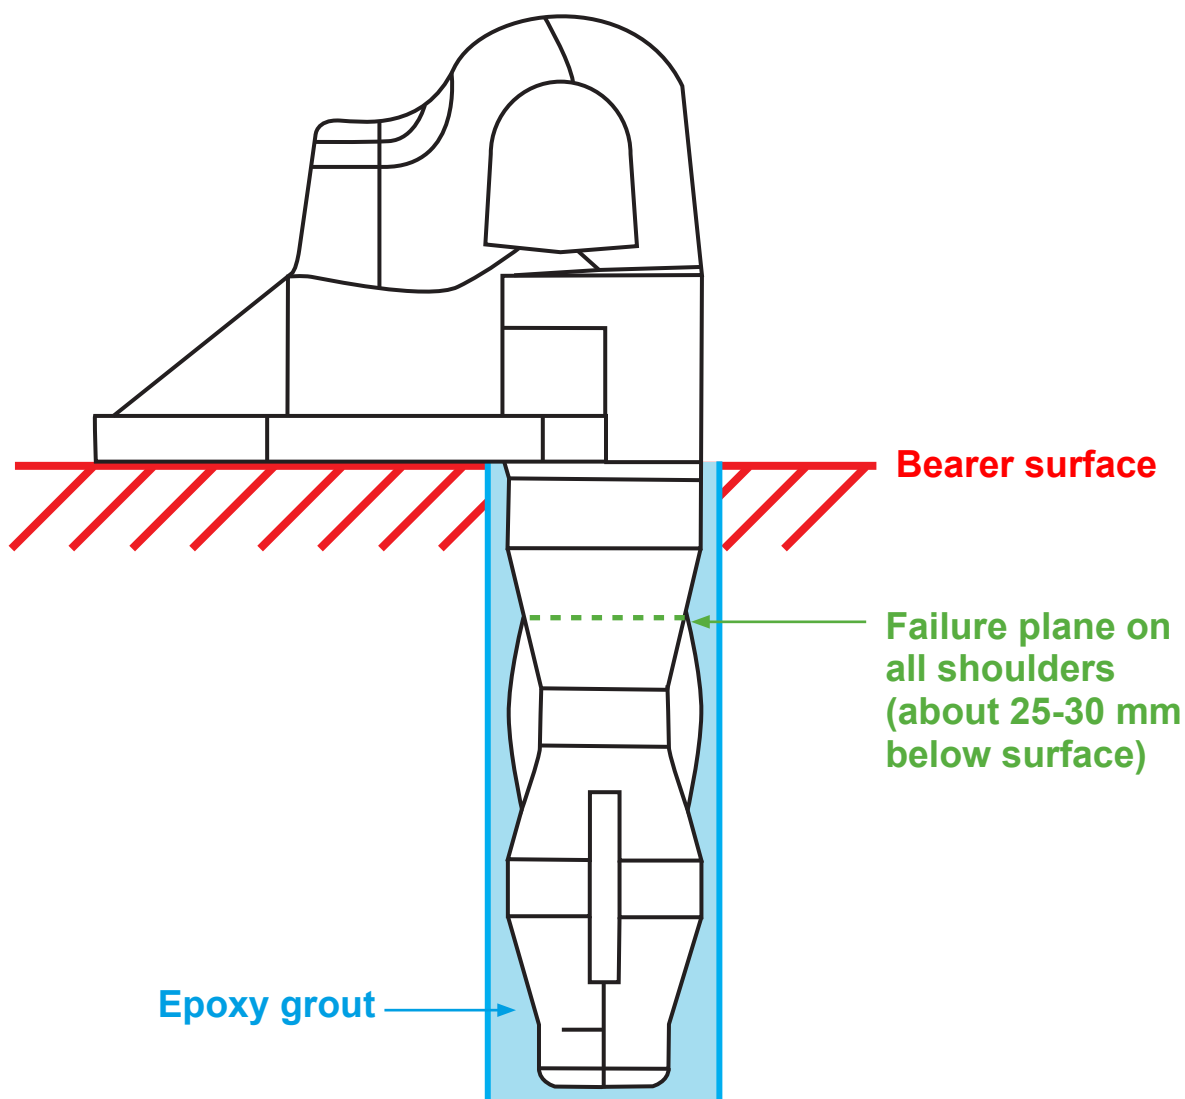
Profile view of a cast iron shoulder indicating the typical plane of failure in green.
